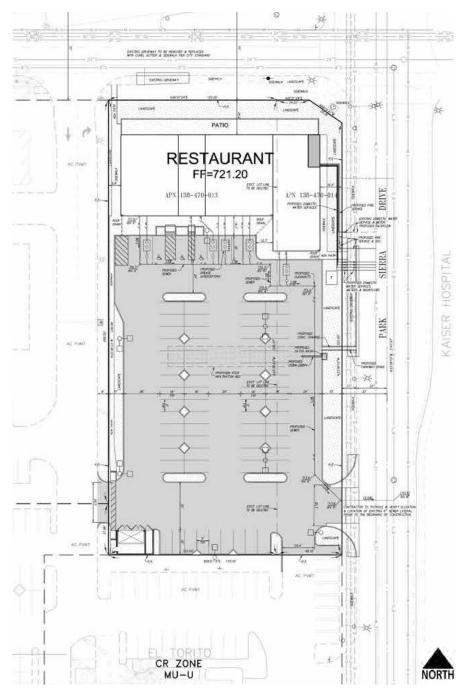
Project Plans (Conceptual Utility Plan)
